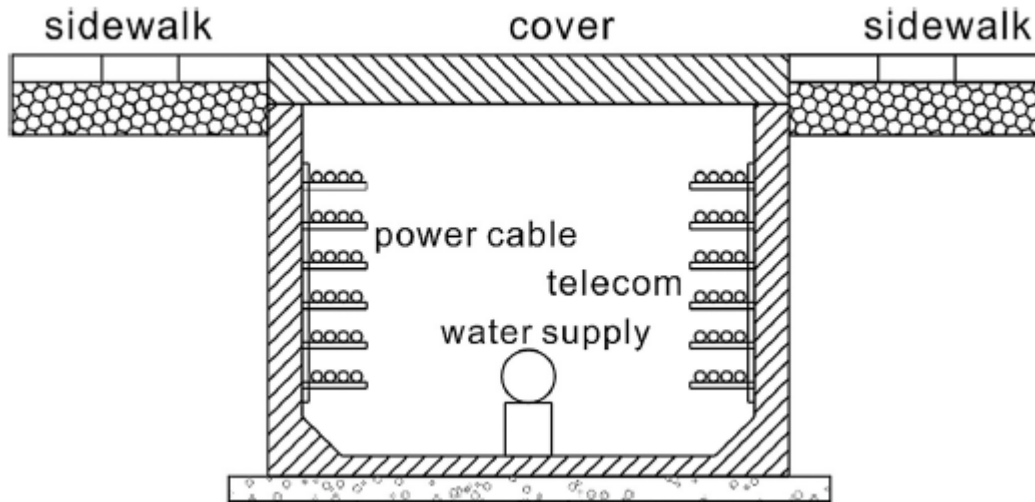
Typical layout of a cable utility tunnel (Wang, T, 2020)
